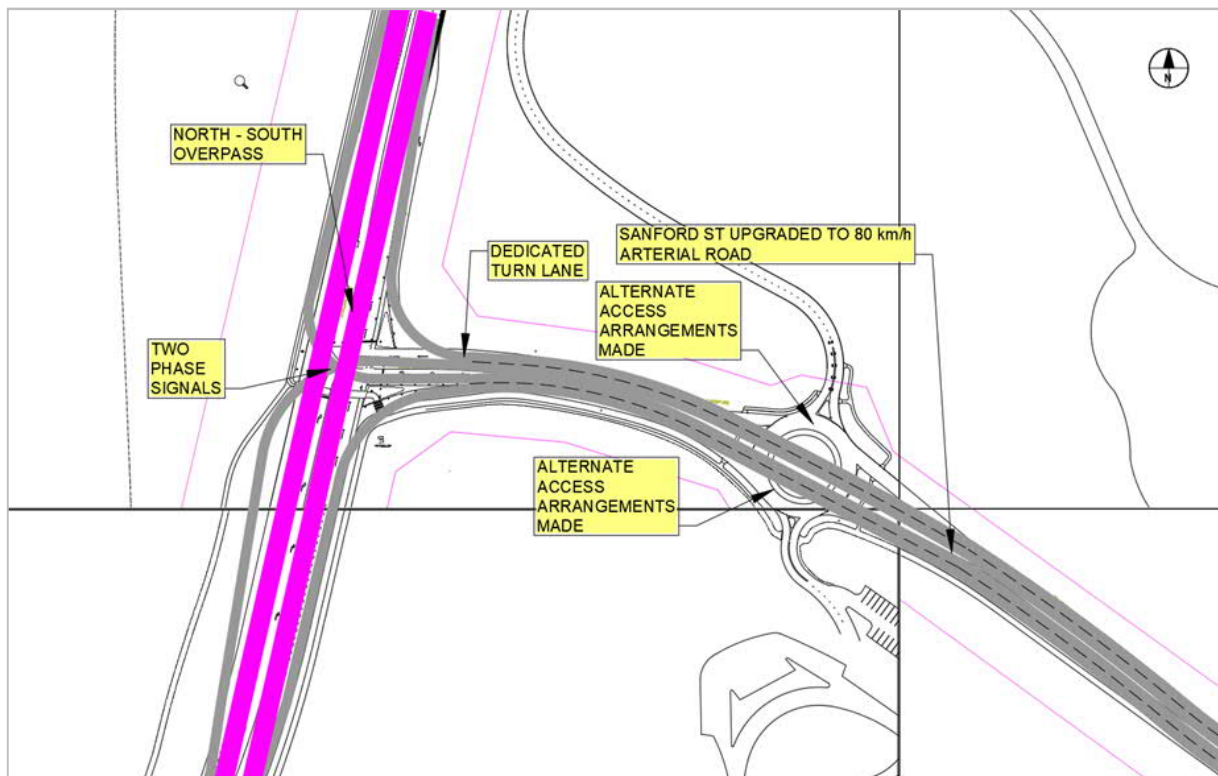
Option 4-2 Grade-separate Sandford Street – Gungahlin Drive intersection
